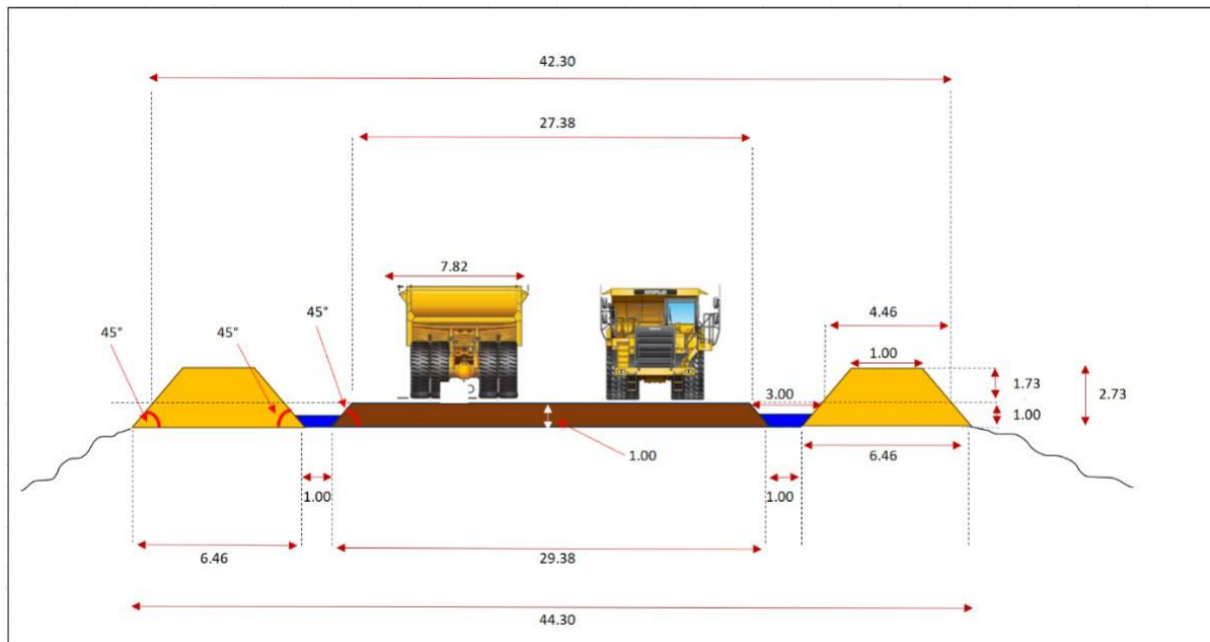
Generic Design for a Fill Section of Haul Road.
